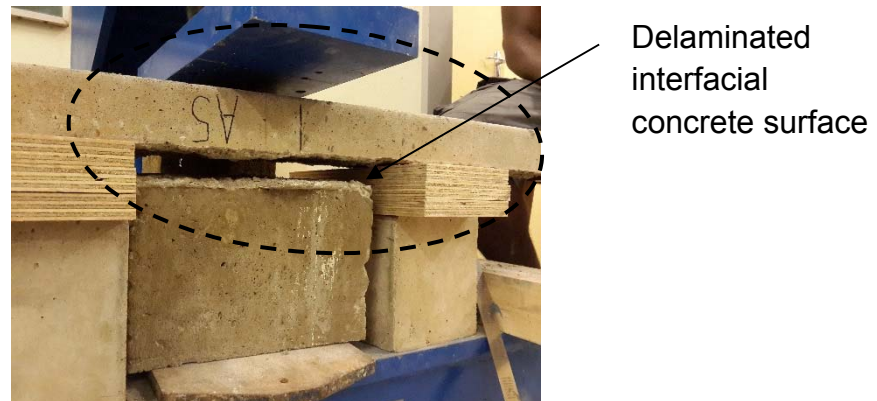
Breaking the precast and cast in-situ concrete elements
